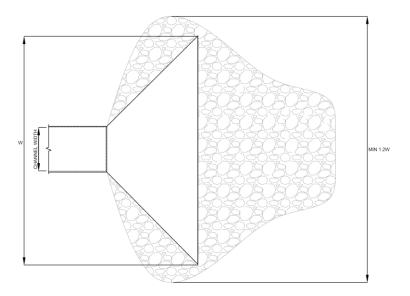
A plan view of a drainage channel to concrete apron to rip-rap (after Caltrans, 2003)
